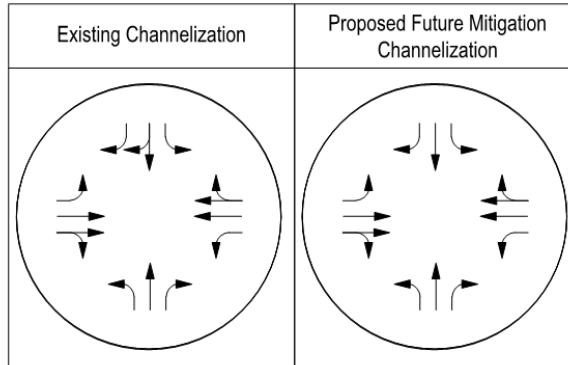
Channelization at the Seattle Hill Road/132nd Street SE Intersection
